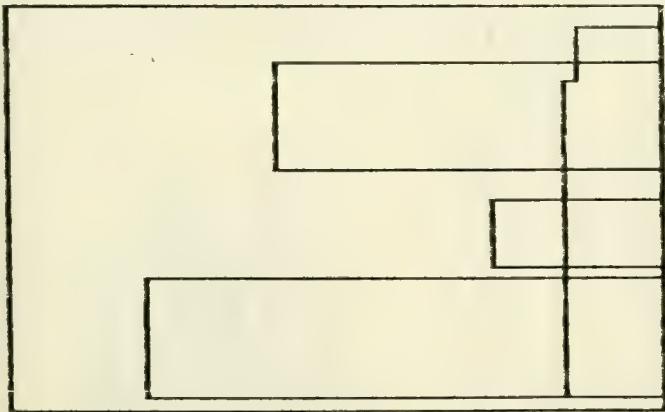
EXISTING CONFIGURATION: OLIVER STREET VIEW
